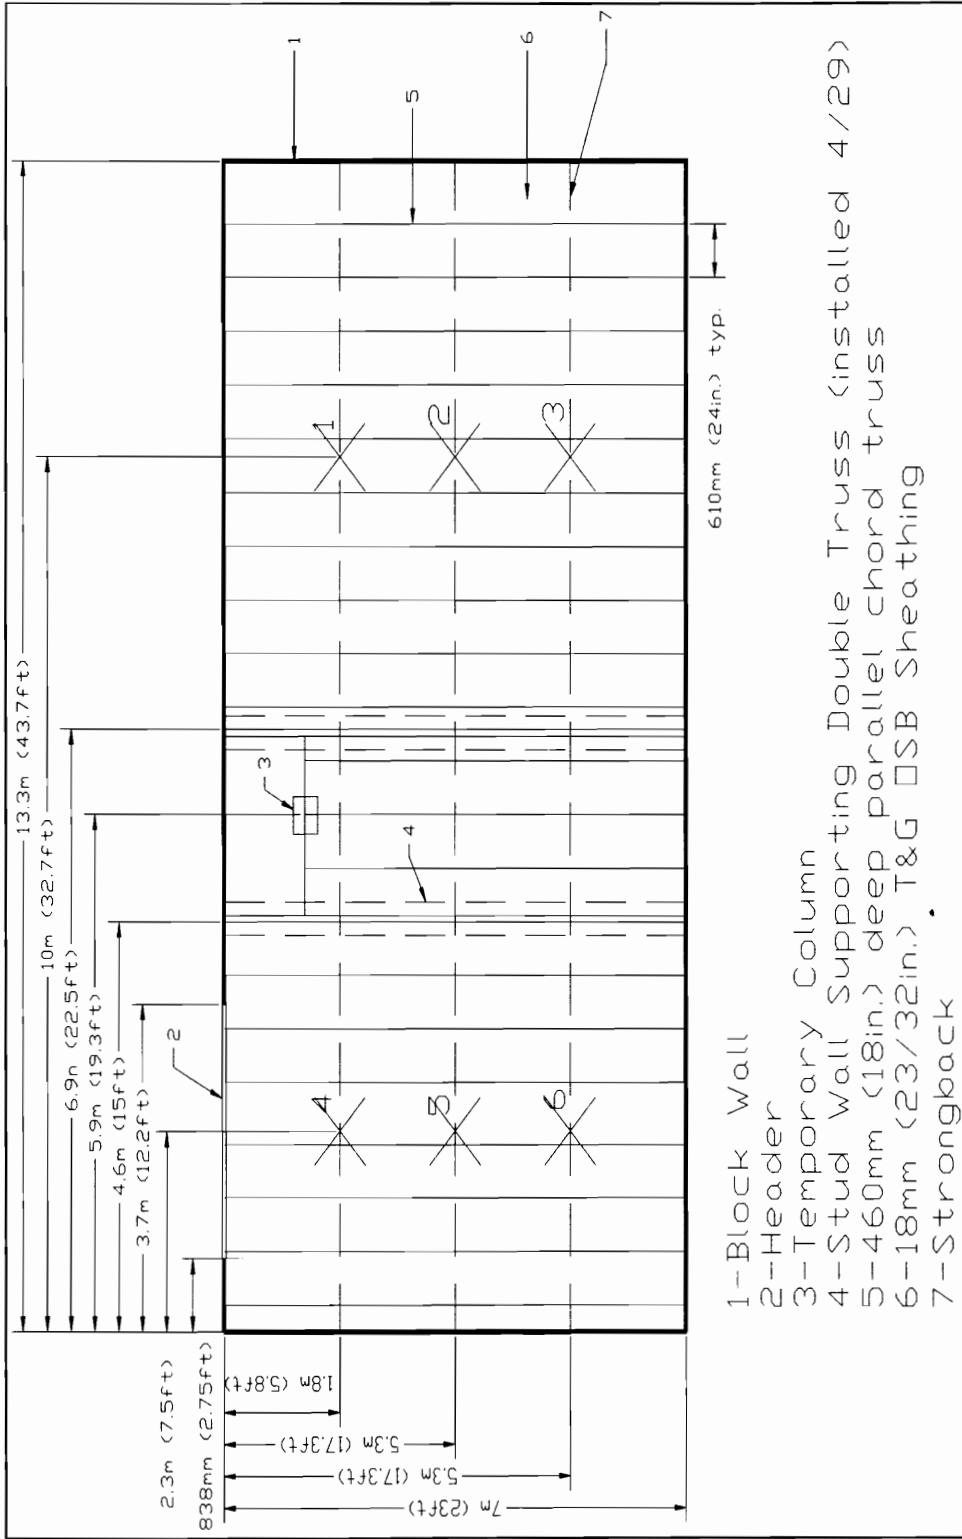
Structural Plan of Parallel Chord Truss House #2
